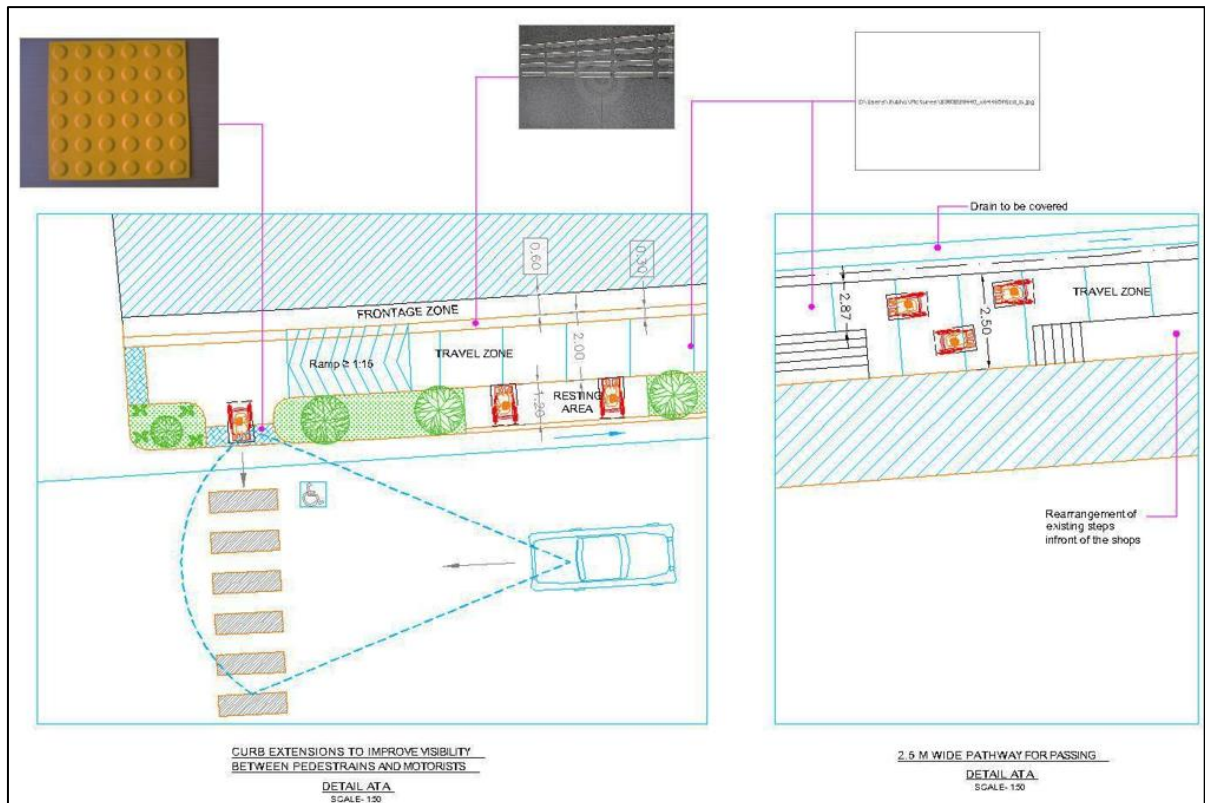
Detail of pedestrian crossing and resting space for wheelchairs (Design Cell)
